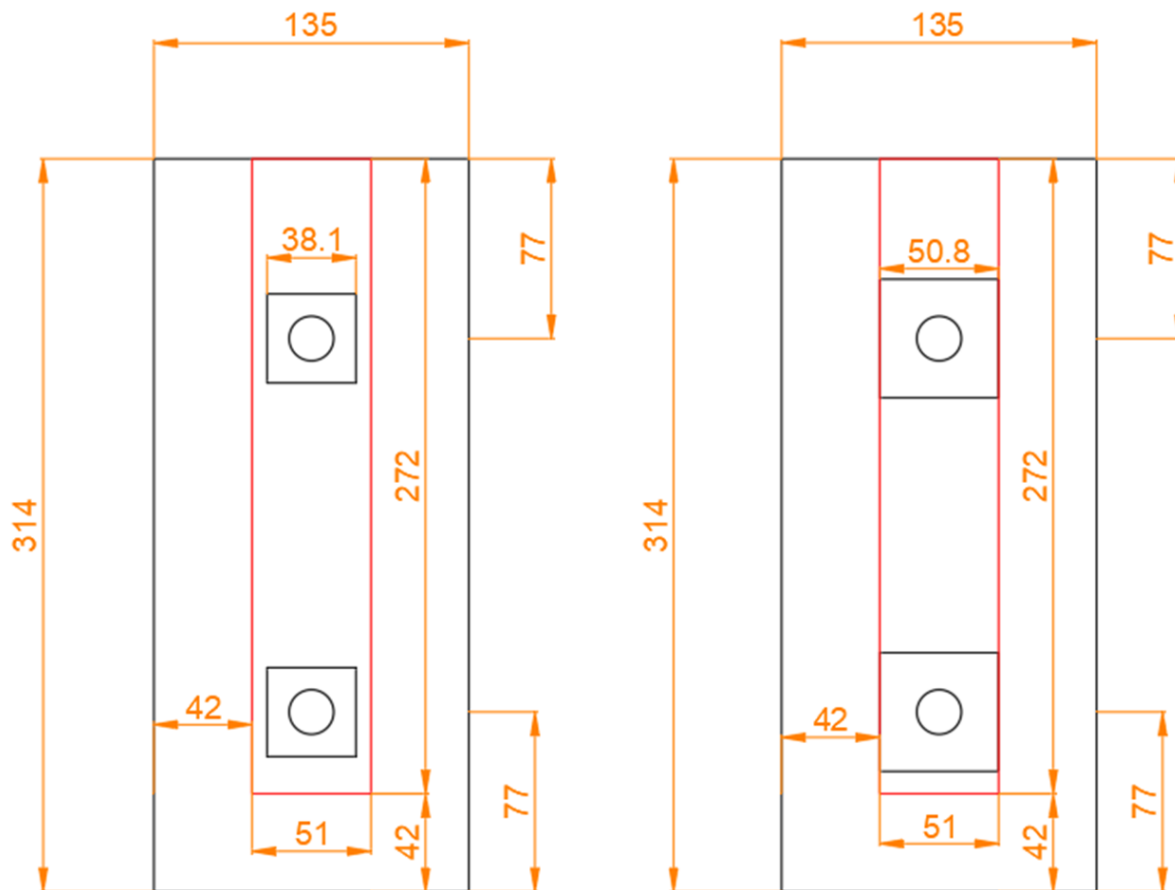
Beam-to-column connections' predicted cross section after standard fire exposure
